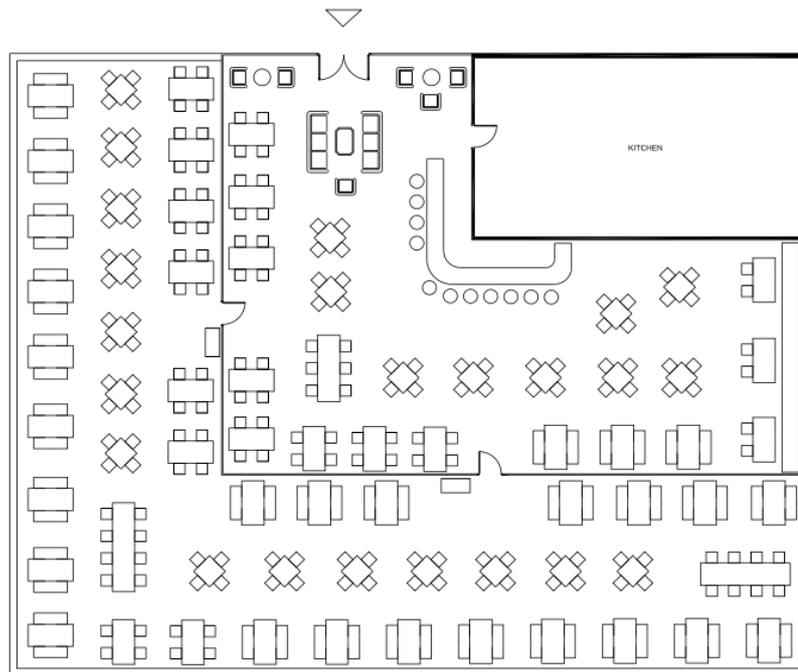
Layout plan of Midpoint, Bilkent Station (Images by Tilbe Korucuoğlu)
